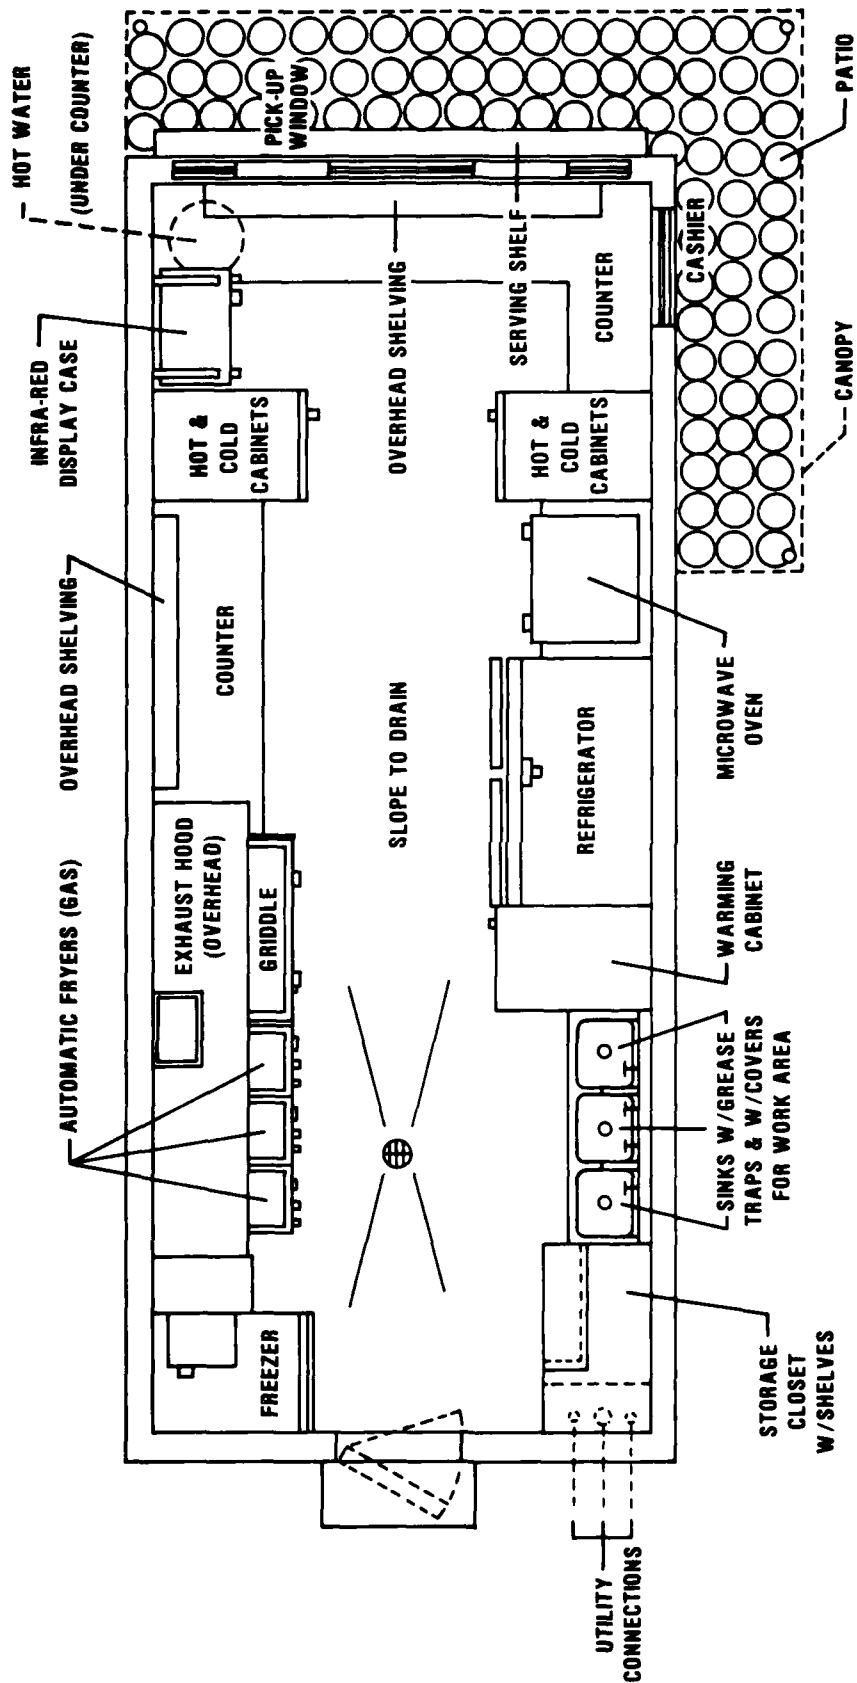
EQUIPMENT LAYOUT OF MODULAR UNIT
